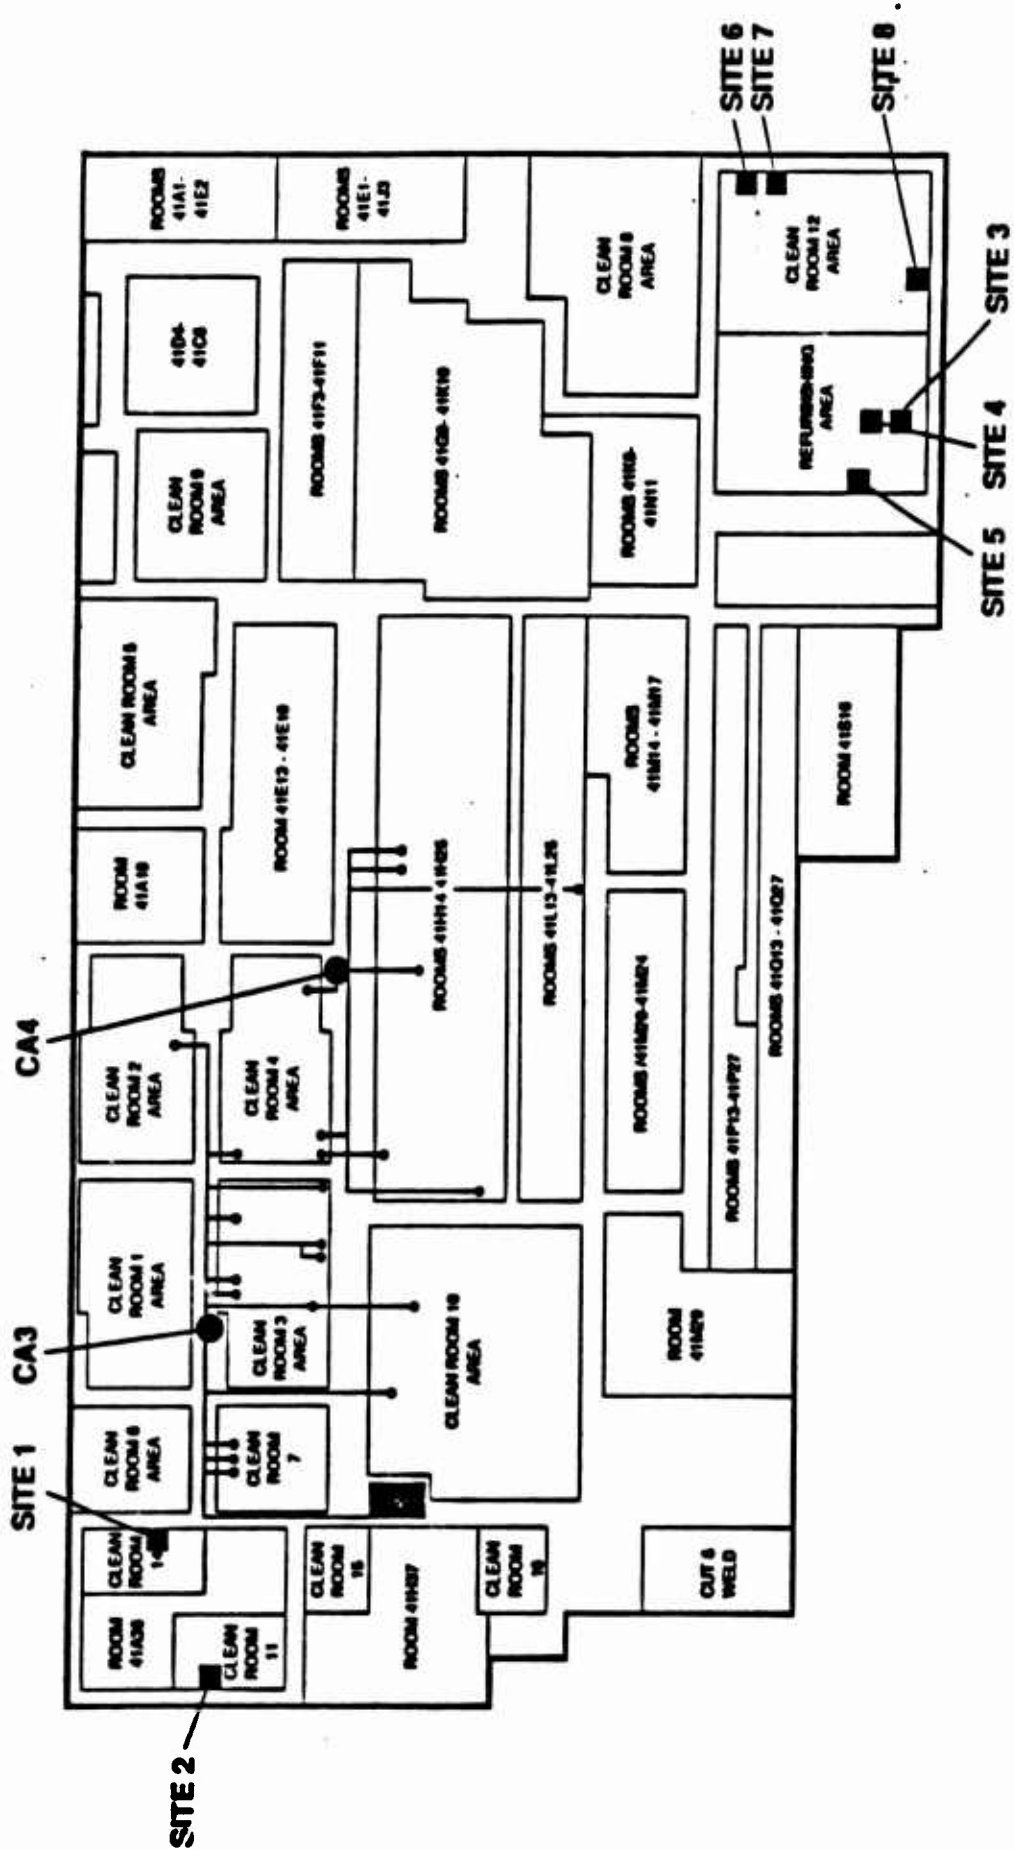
Building 4 First Floor Plan, Newark Air Force Base
